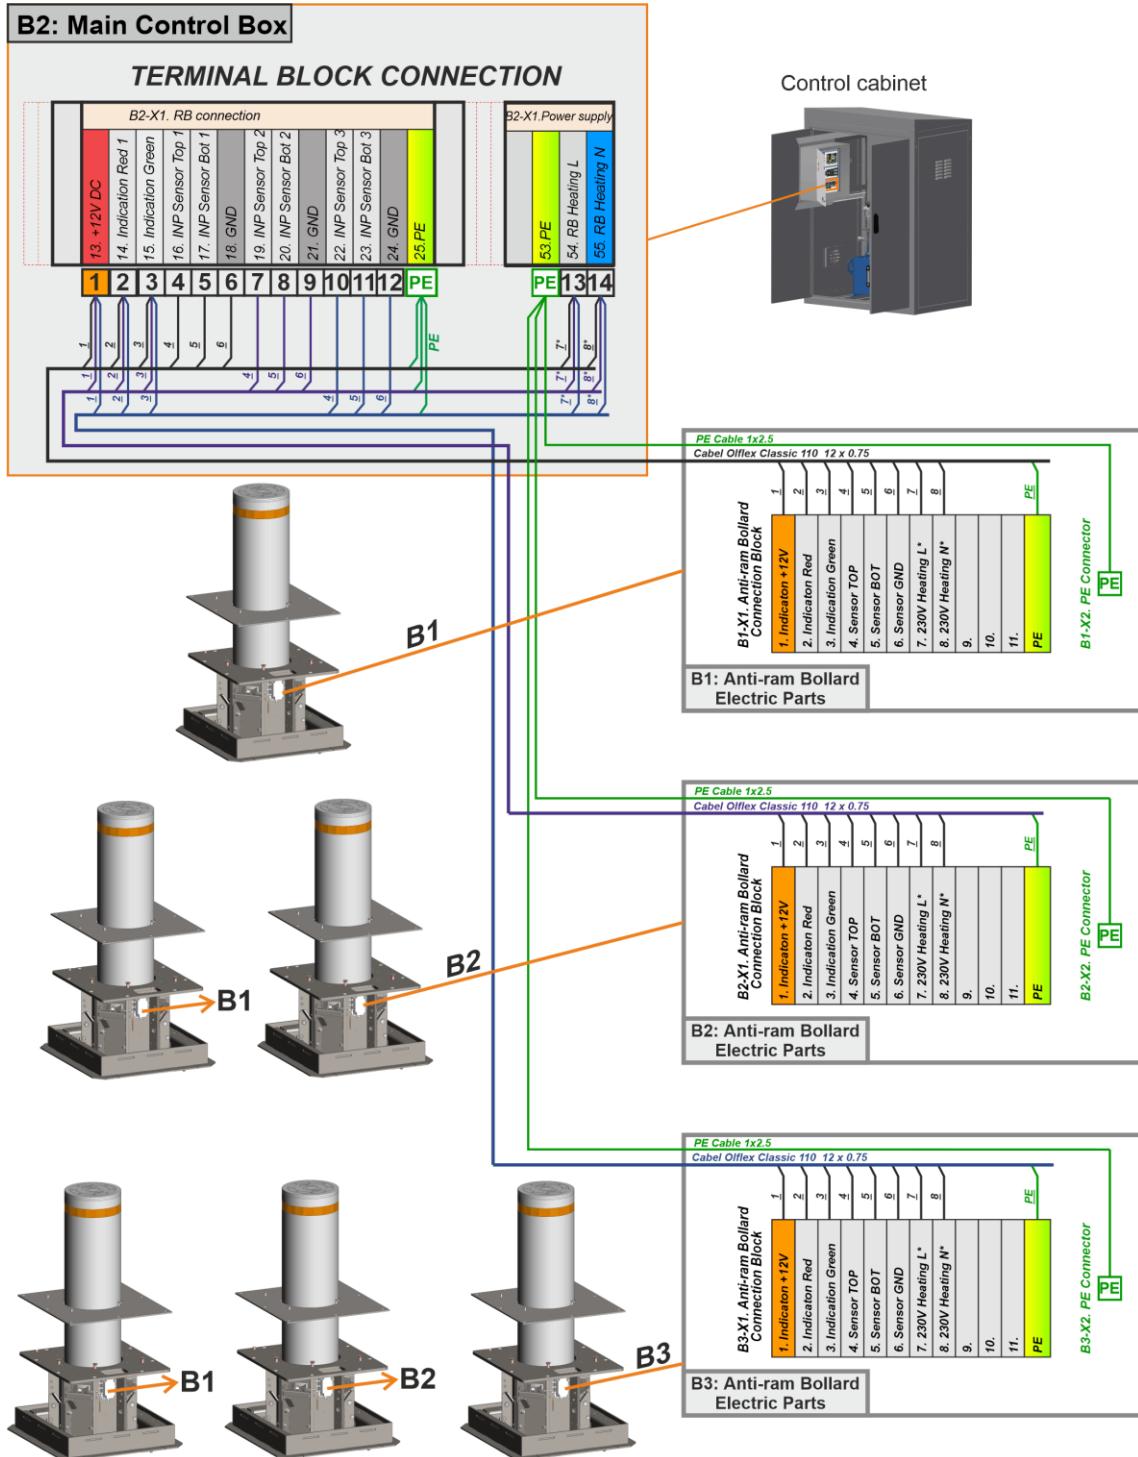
Wiring Diagram for Connecting the Bollard to the ECU
